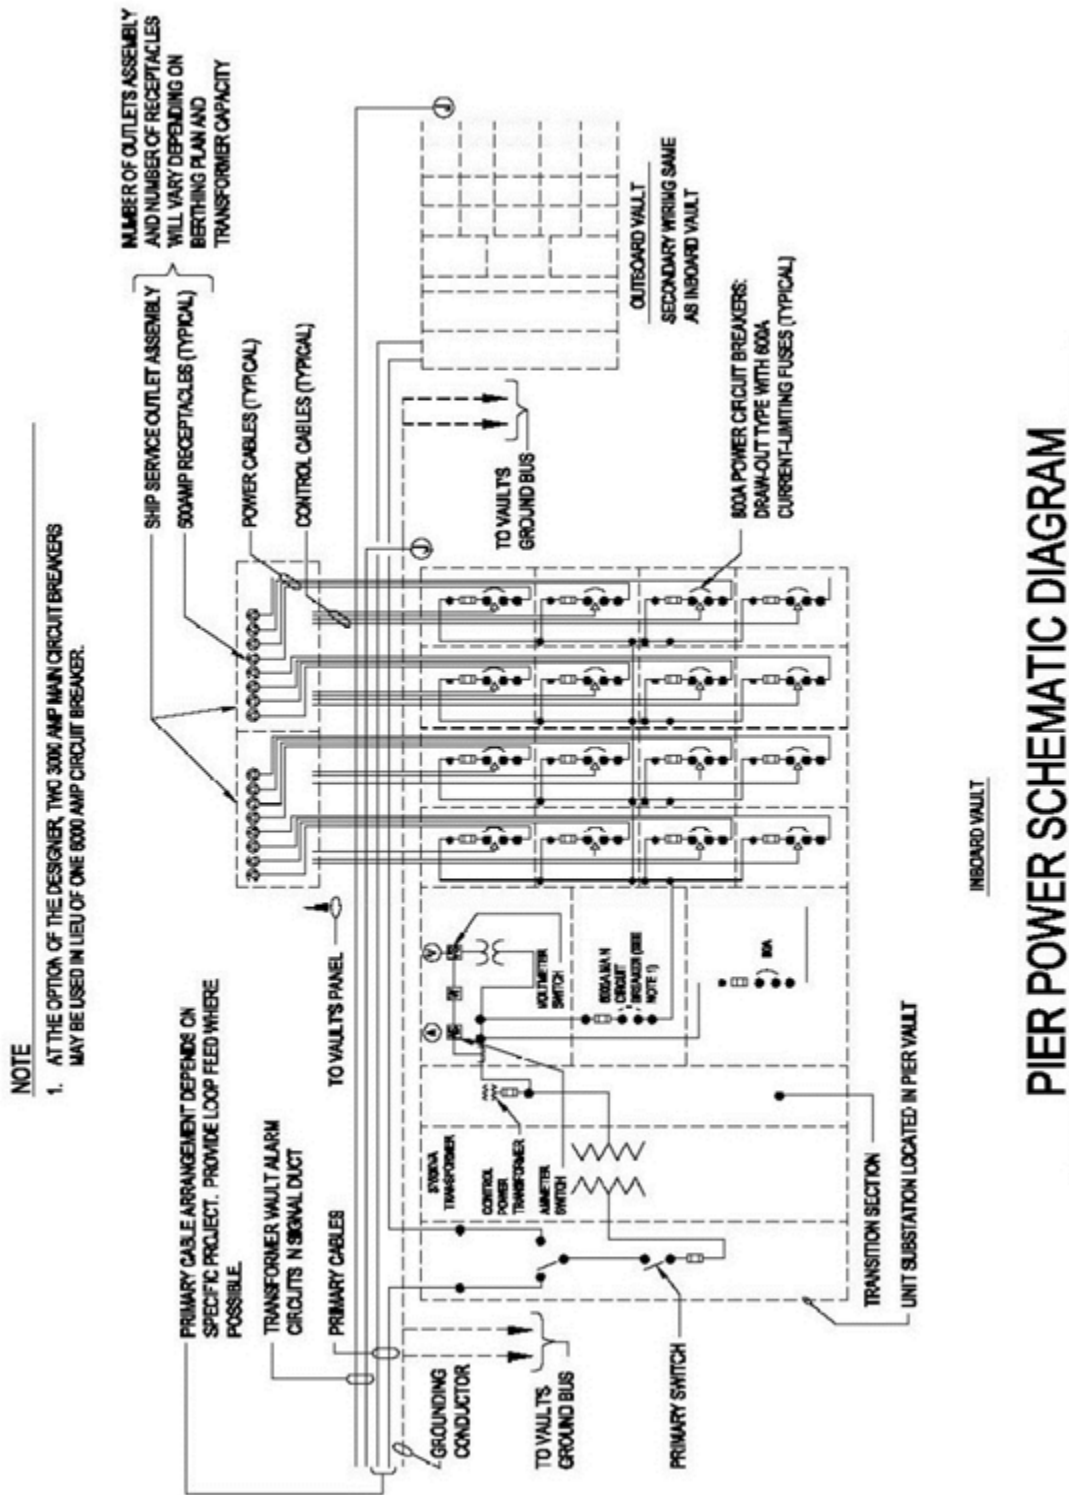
(e) Pier Electrical Distribution: Typical Vault System (5 of 5)
